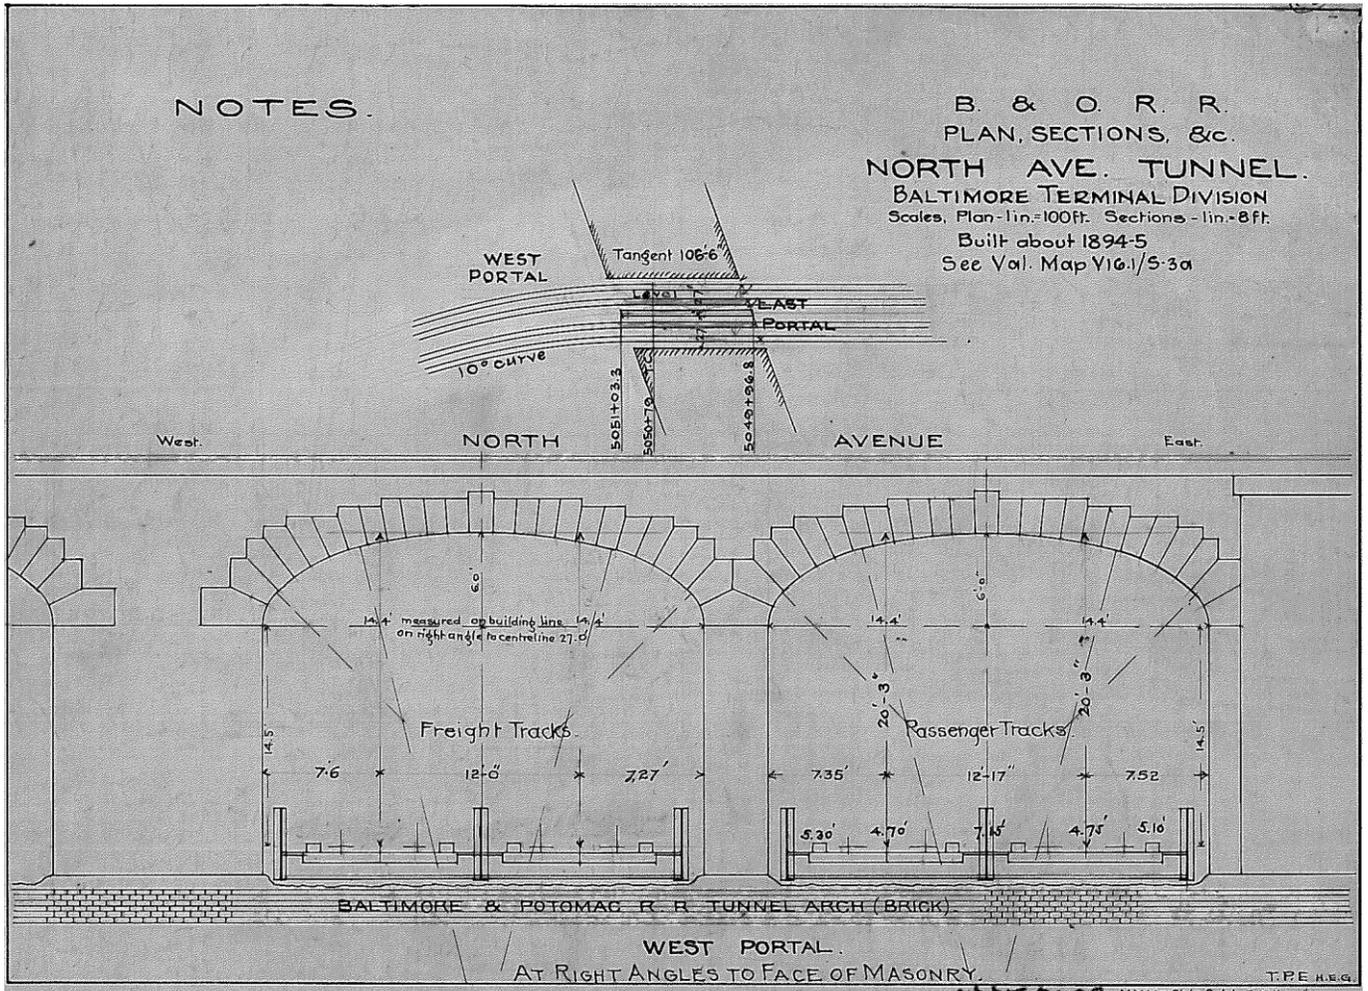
Plan sheet showing the B&O Railroad south portals, indicated in the image as the “west portal,” above the B&P Tunnel arch, from “B&O RR Plan, Sections, &c. North Ave. Tunnel,” 1905 (annotated in 1905, 1910, and 1911).
